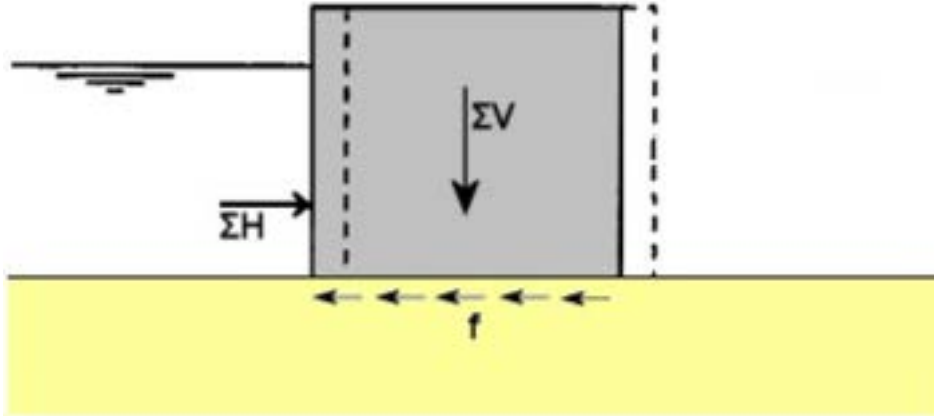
slip-off principle sketch. Source: Hydraulic Structures Manual
